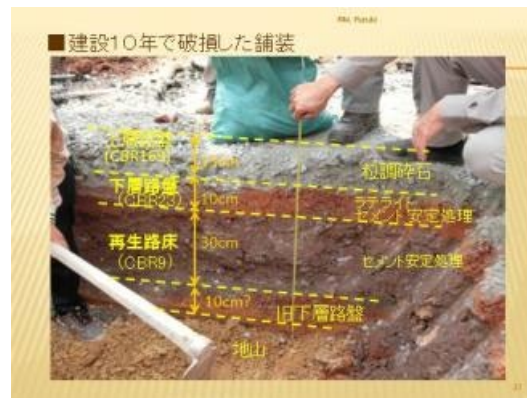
Pavement Damage on Guinea's National Highway 1
